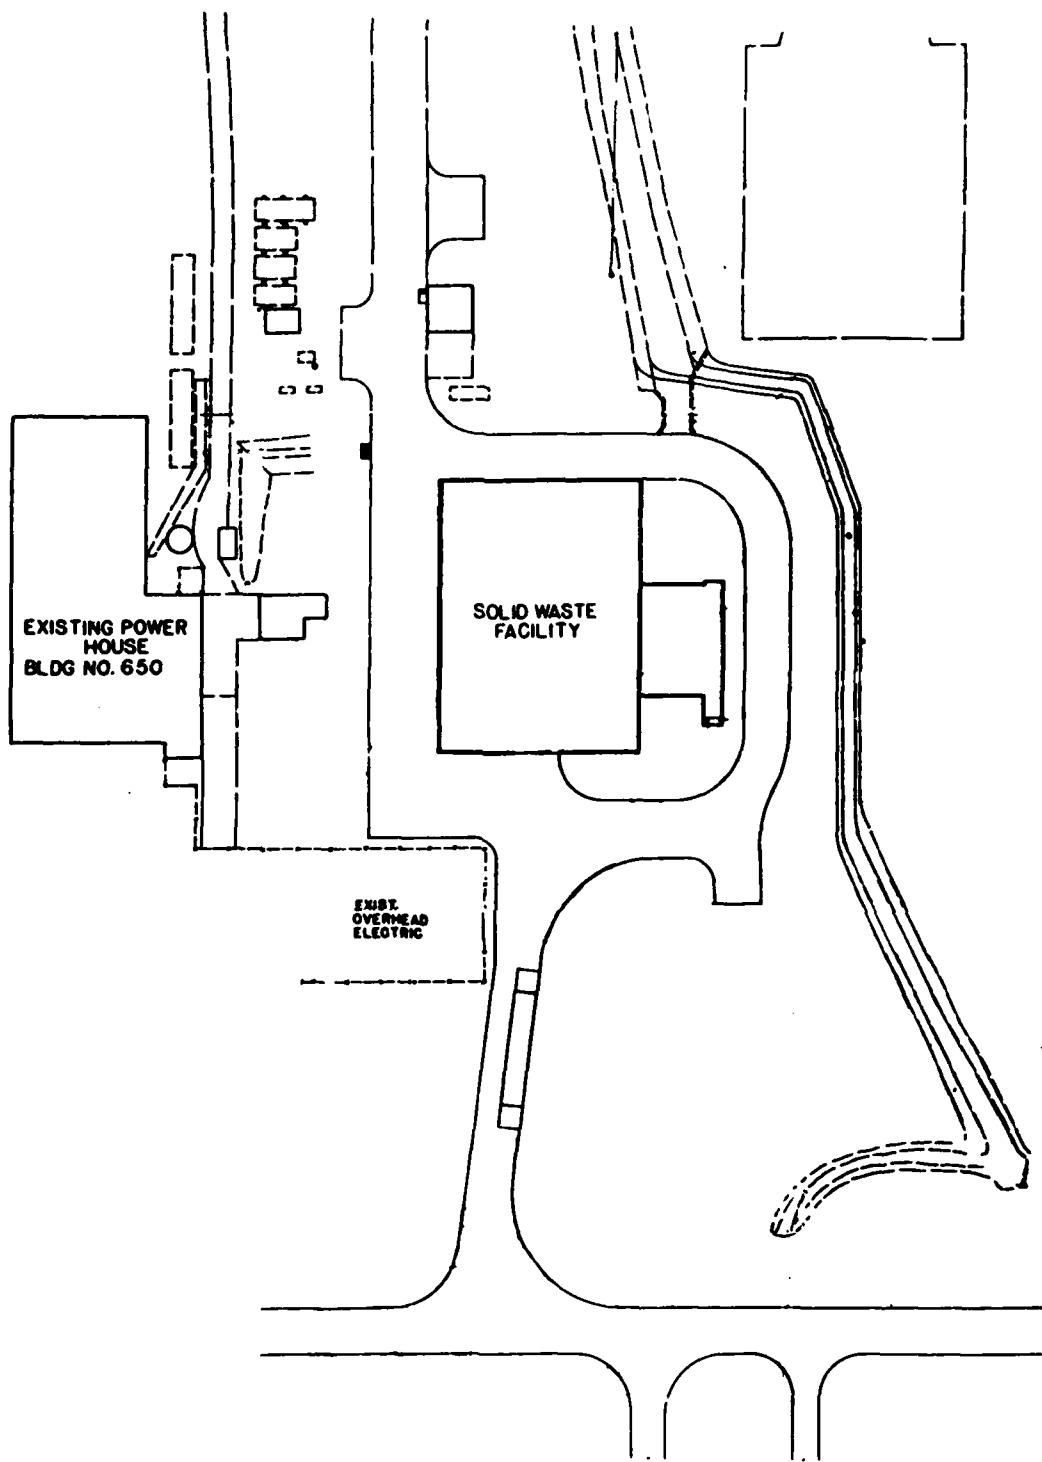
Site layout, NAS Jacksonville HRI facility.¹⁷
